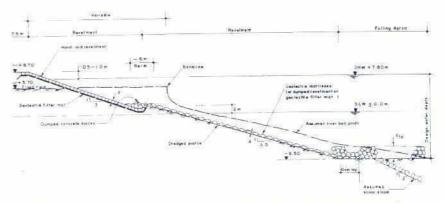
Typical section of a revetment structure for under-water construction
